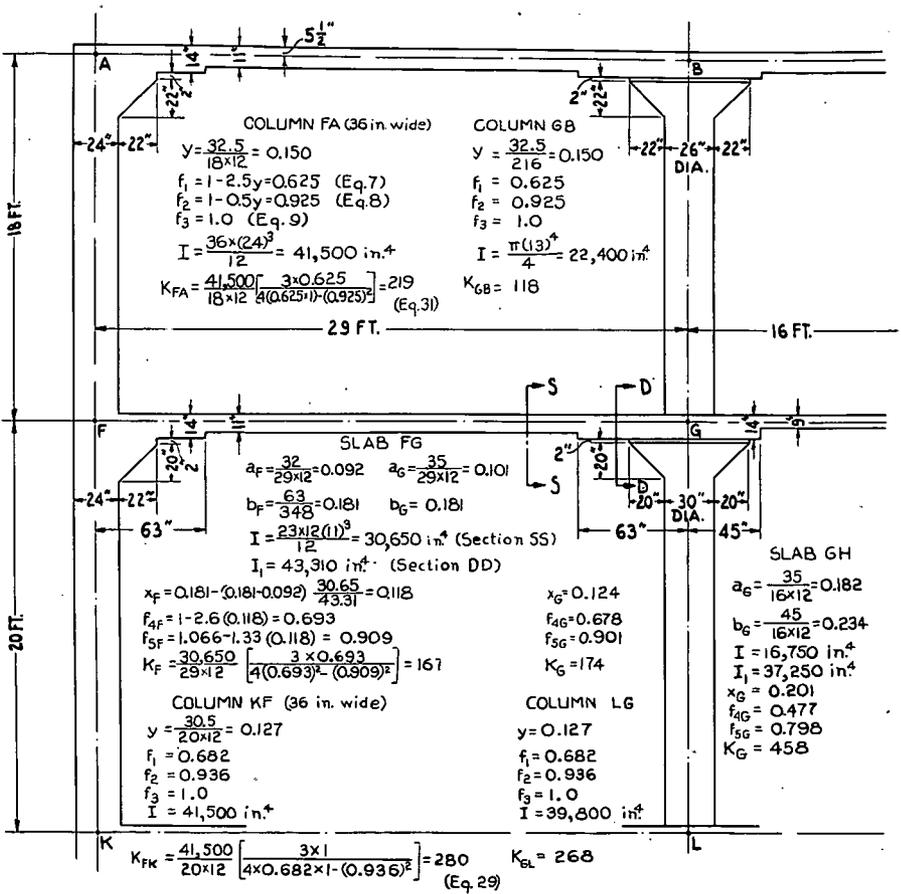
SLAB AND COLUMN CONSTANTS FOR SPAN FG
